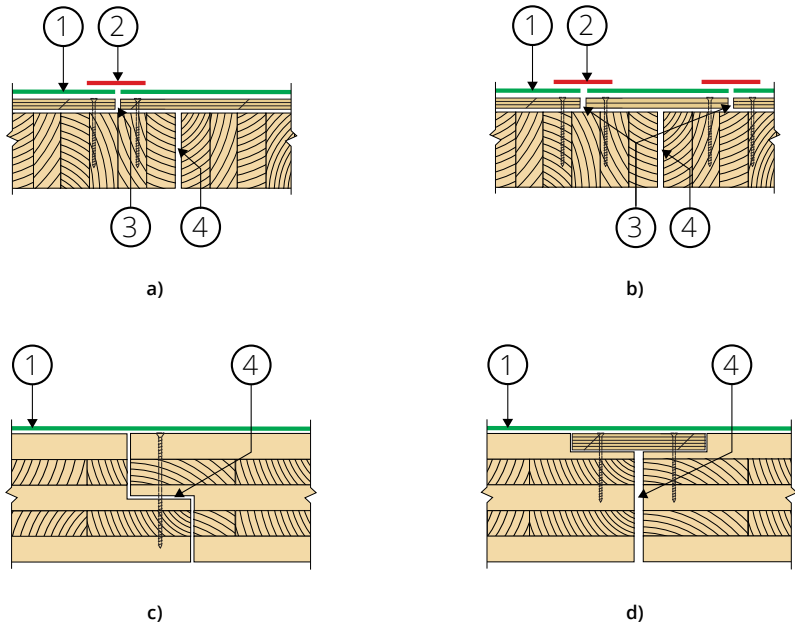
Splice joint and drag strut connections visible at CLT panel interfaces.
